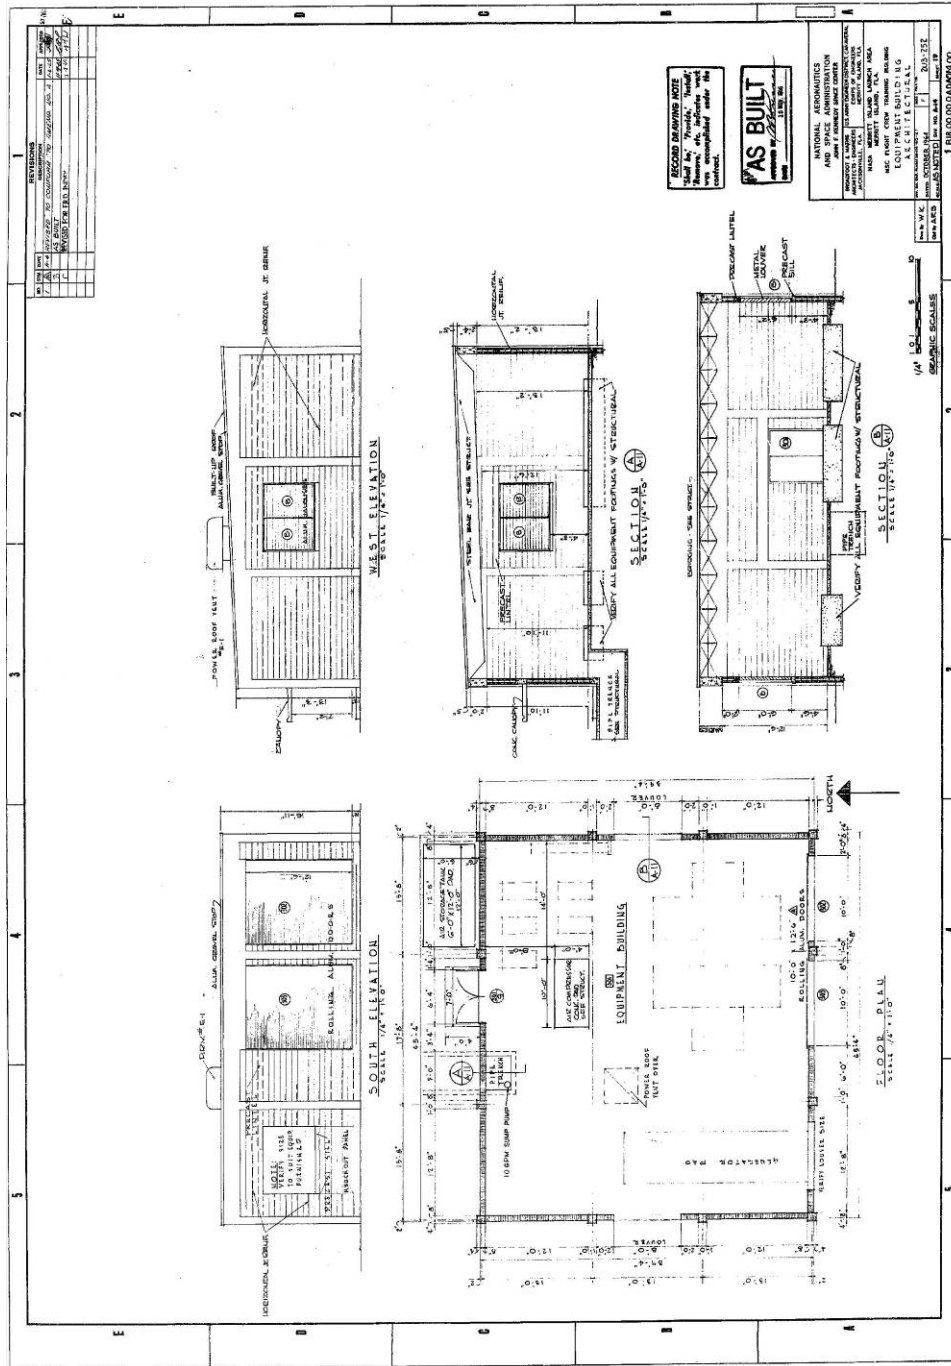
Broadfoot & Mathis, Flight Crew Training Building, Equipment Building, October 1964, Sheet 19.
